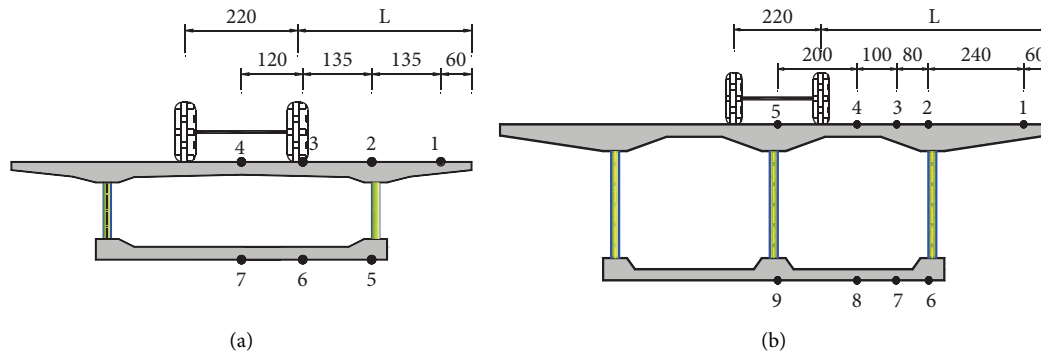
Schematic layout of the measuring points of the composite box girder: (a) single box, single cell measuring point arrangement (cm) and (b) single box, twin cell measuring point arrangement (cm).
